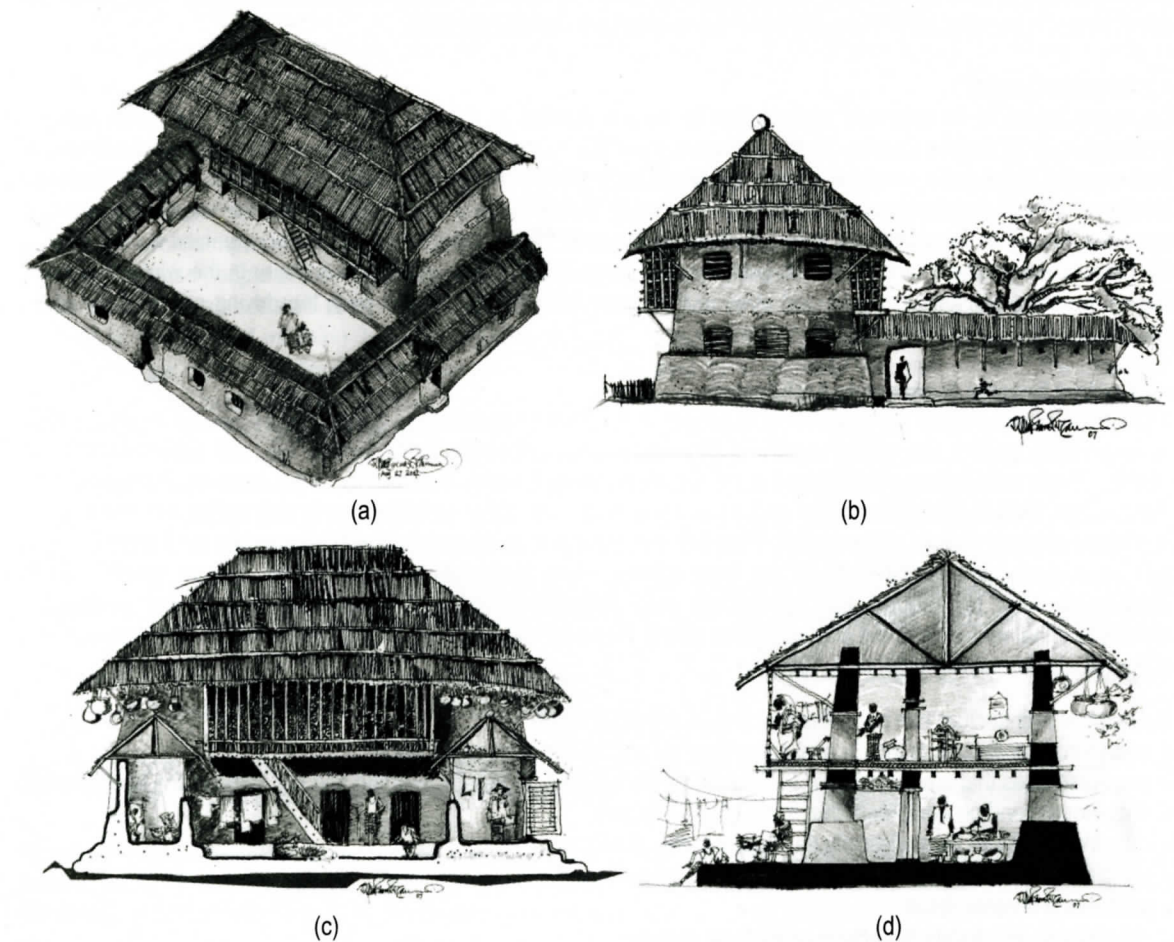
(a) axonometric view of a DO MAHELA, (b) side elevation, (c) longitudinal section & (d) cross section
